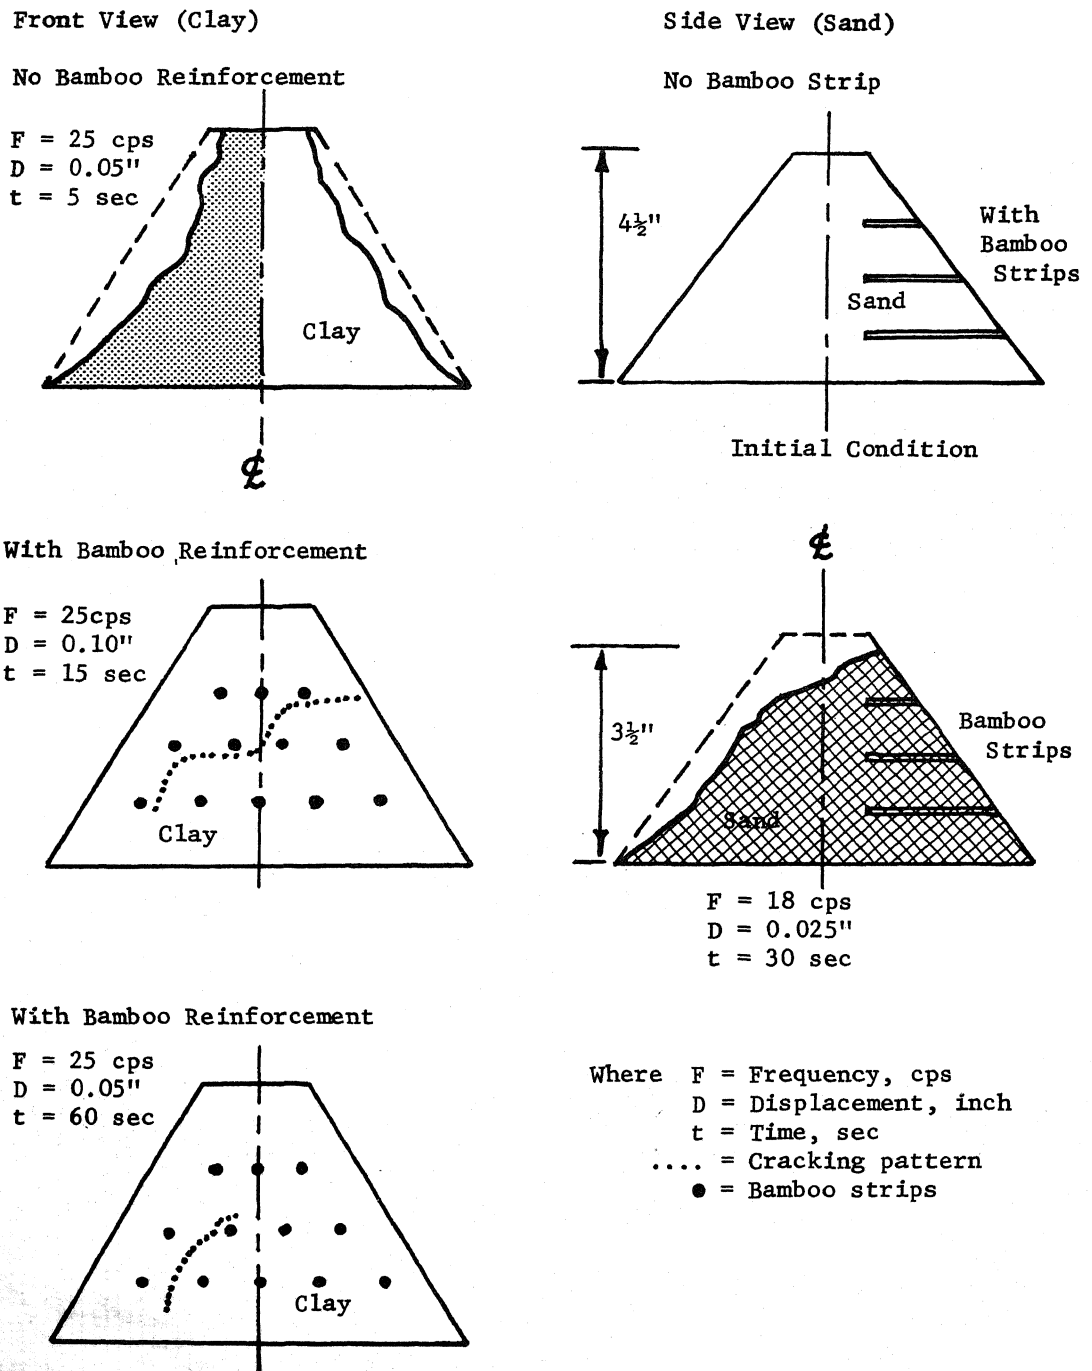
TYPICAL CRACKING AND FAILURE PATTERN OF COMPACTED EMBANKMENT WITH OR WITHOUT BAMBOO REINFORCED UNDER SEISMIC LOADING
